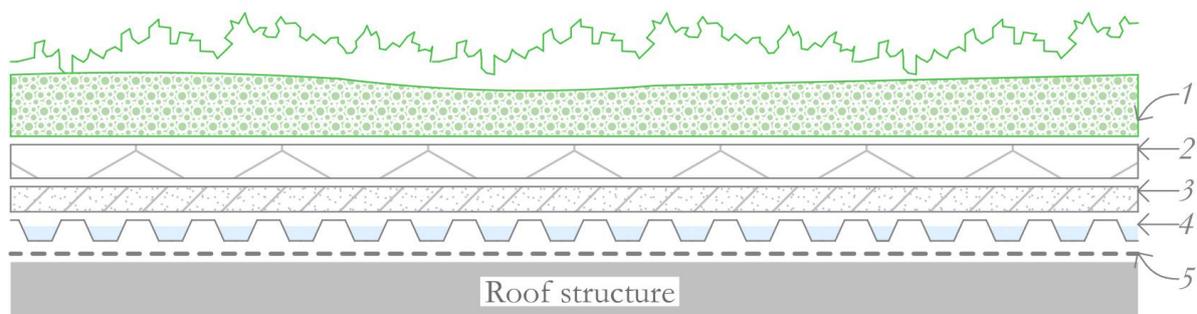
Extensive Green Roof: Cross-section depicting the different GR layers
